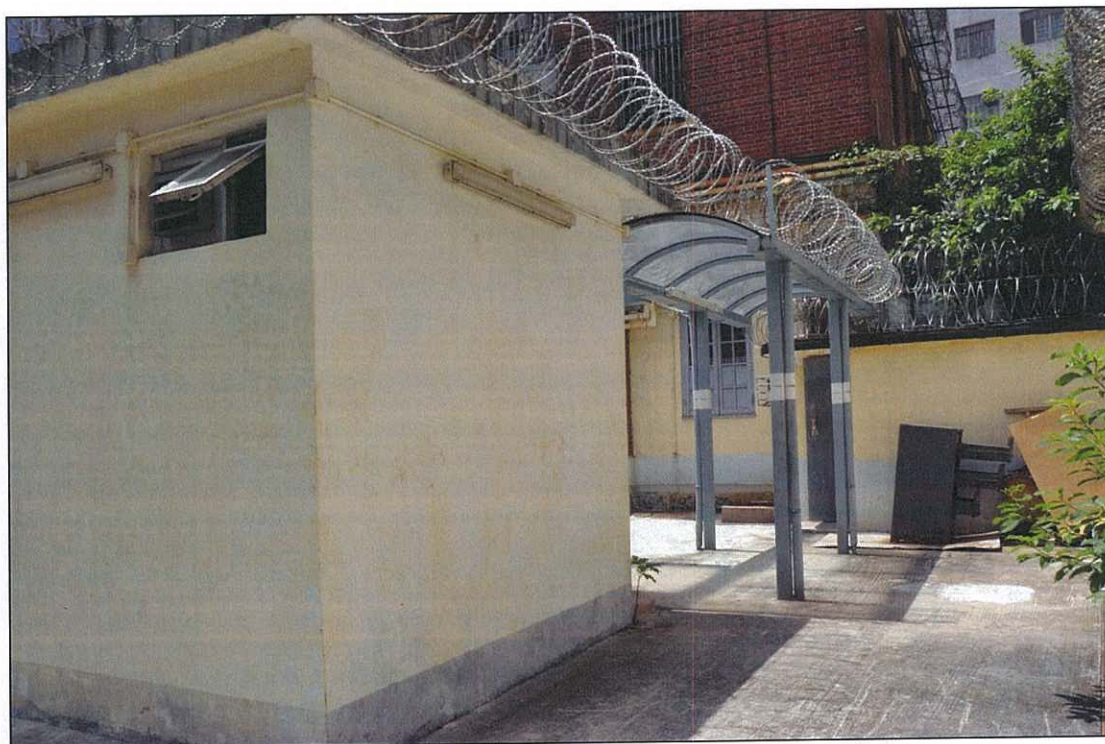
West elevation and north elevation, west part (2011/08/13)
